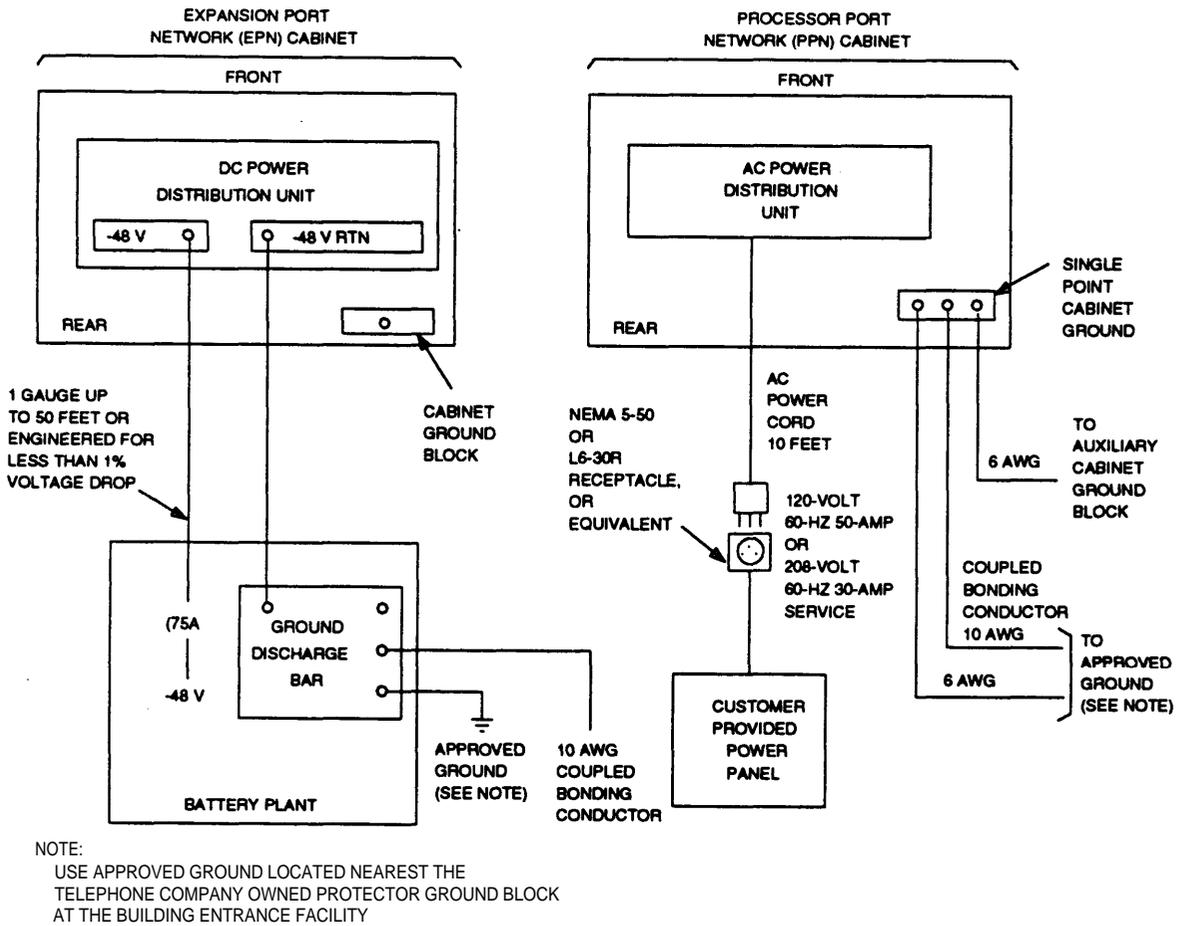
Typical DEFINTY G1 Multicarrier Cabinet System AC and DC Power and Ground Wiring — Remote EPN
